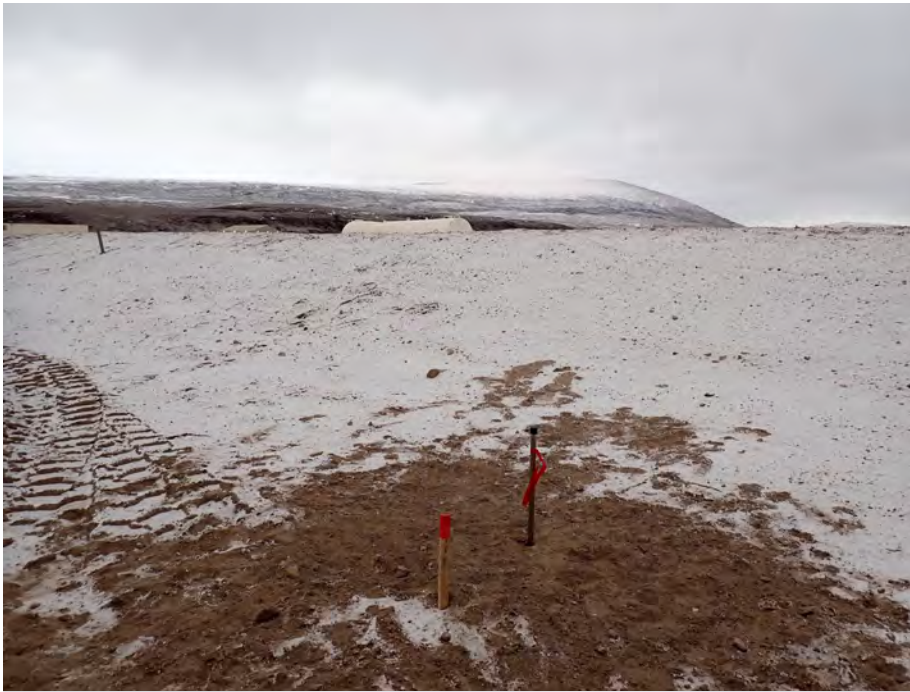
Drive-point piezometer installation - monitoring location MS-HWB-GW3, facing northeast. September 19, 2021
